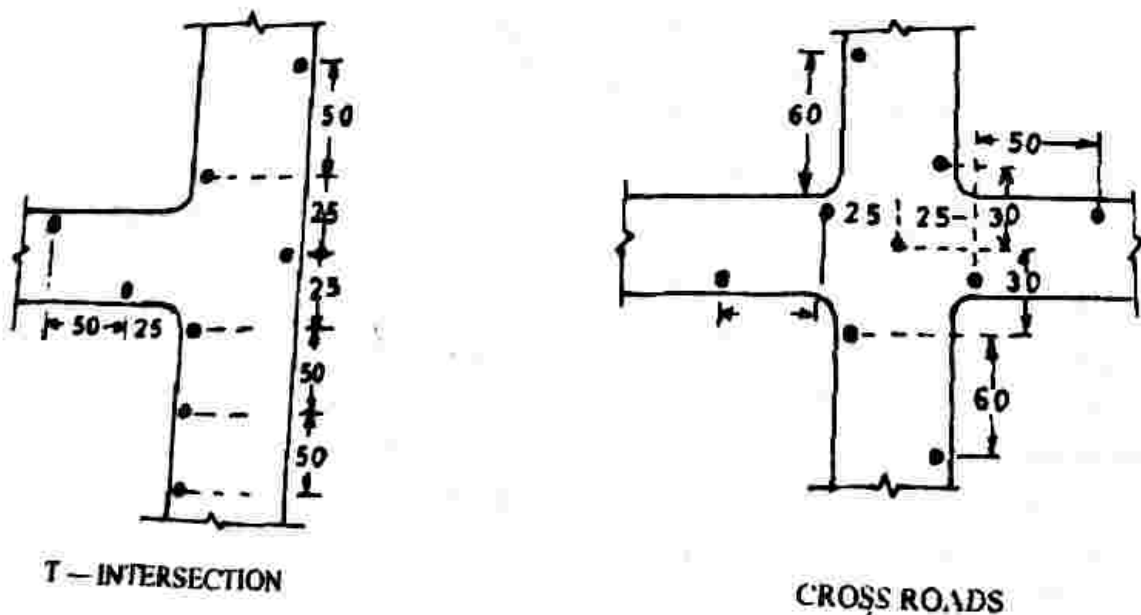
(a) & (b). Lighting Layout for Intersections.
